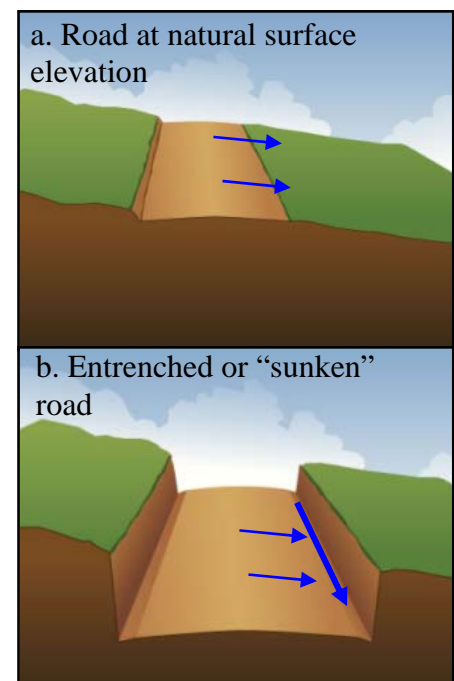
Entrenched or “sunken” roads trap drainage on the roadway.
